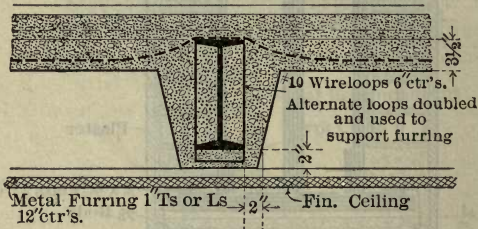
Furred Ceiling Construction, U. S. P. O. Bldg., Richmond, Va.
